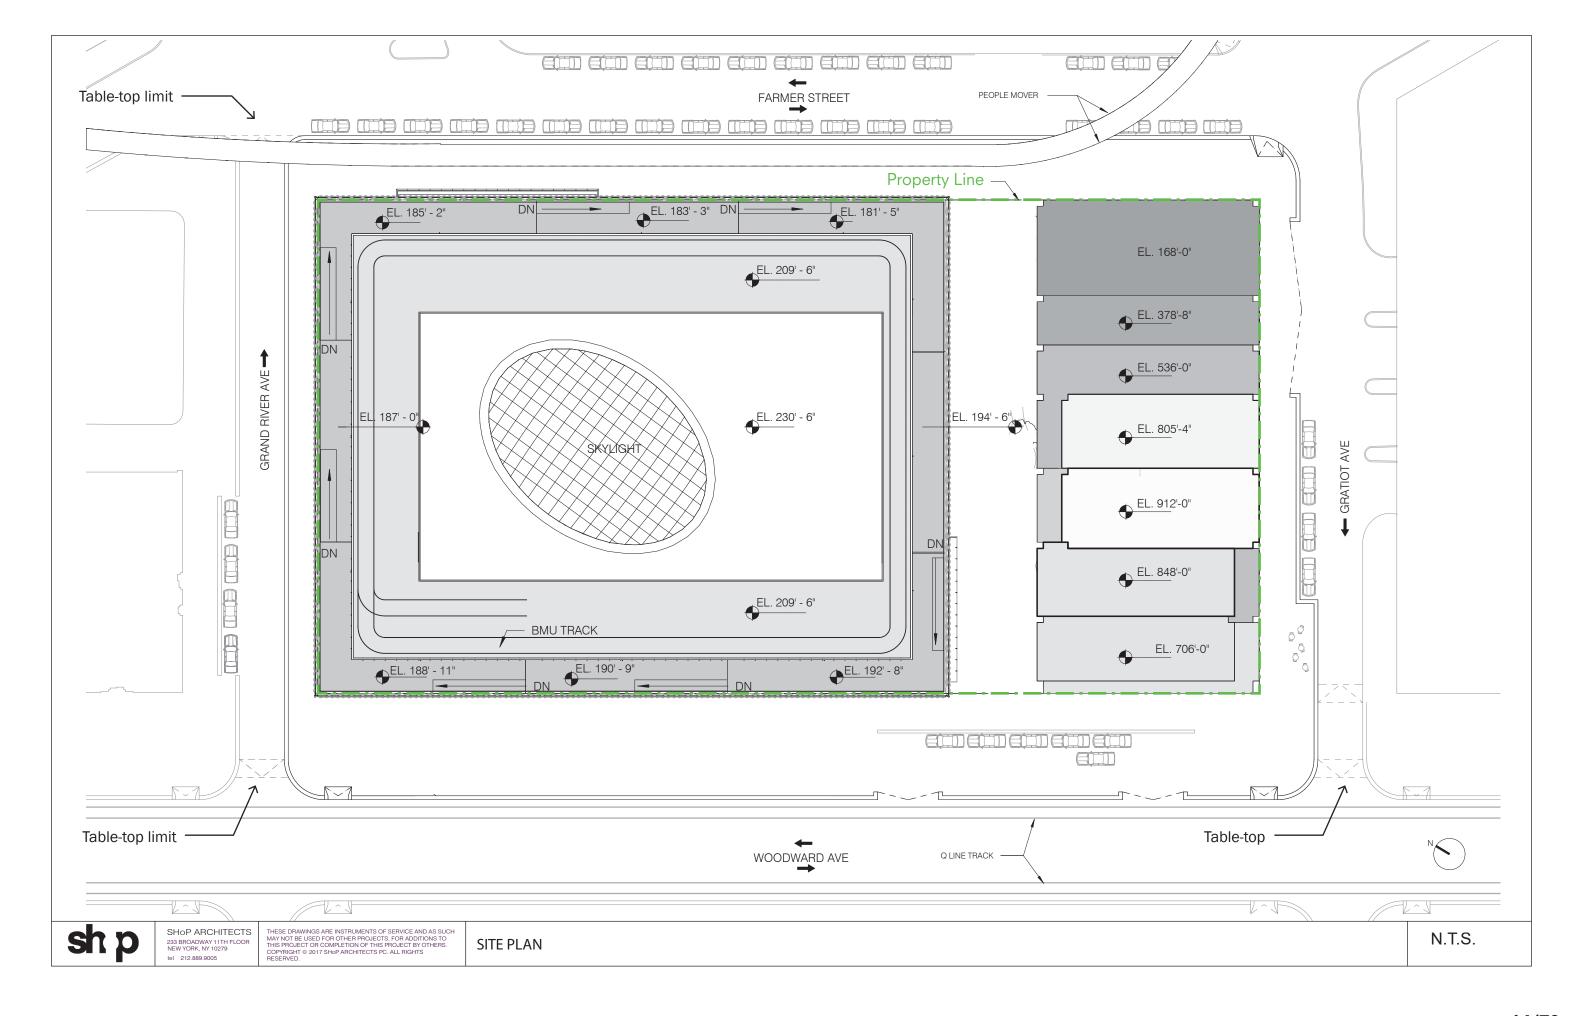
Enlarged Woodward Avenue Site Plan (Note: Design still in development)
